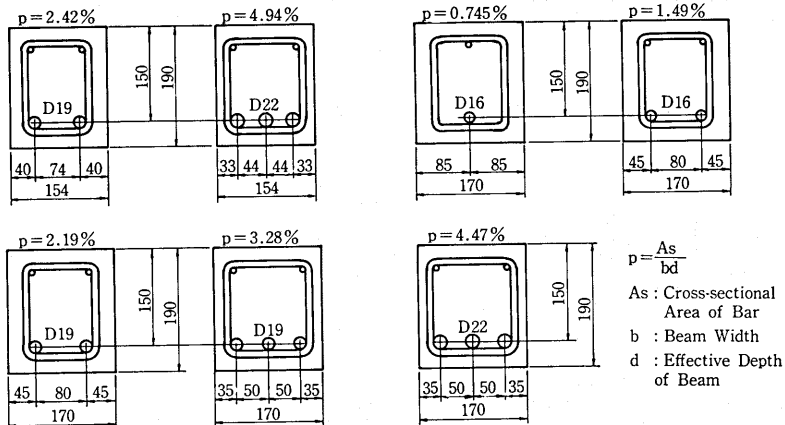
Cross Sections and Reinforcement Quantities of Beam Specimens
